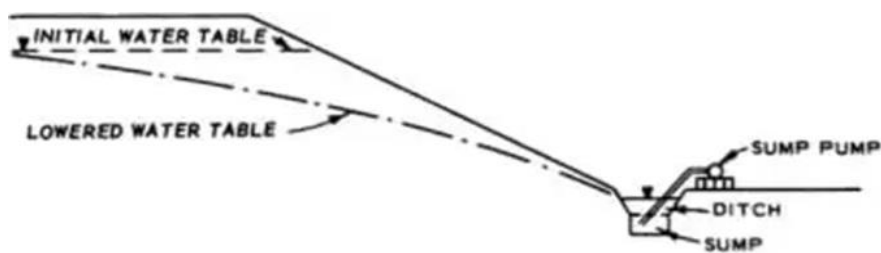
Dewatering by Sumps, Sump pumps, and Ditching.⁸
